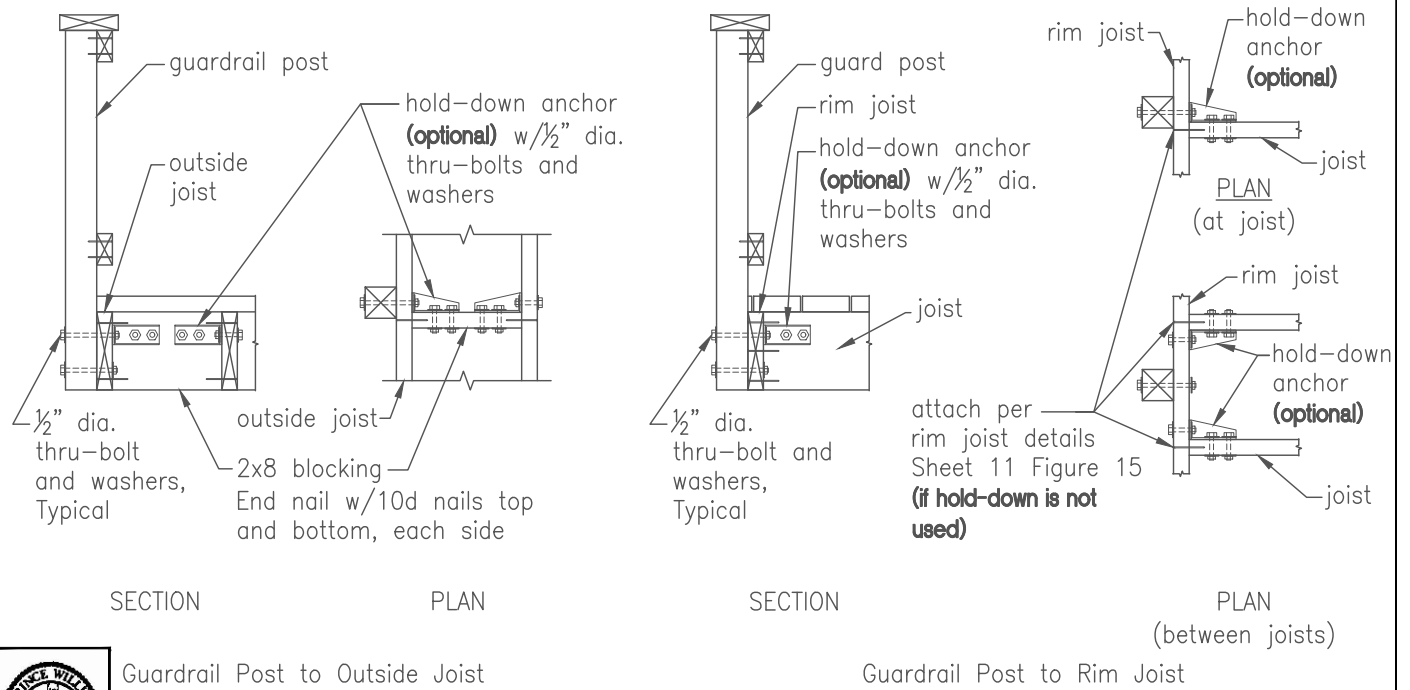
GUARDRAIL POST CONNECTION DETAIL
